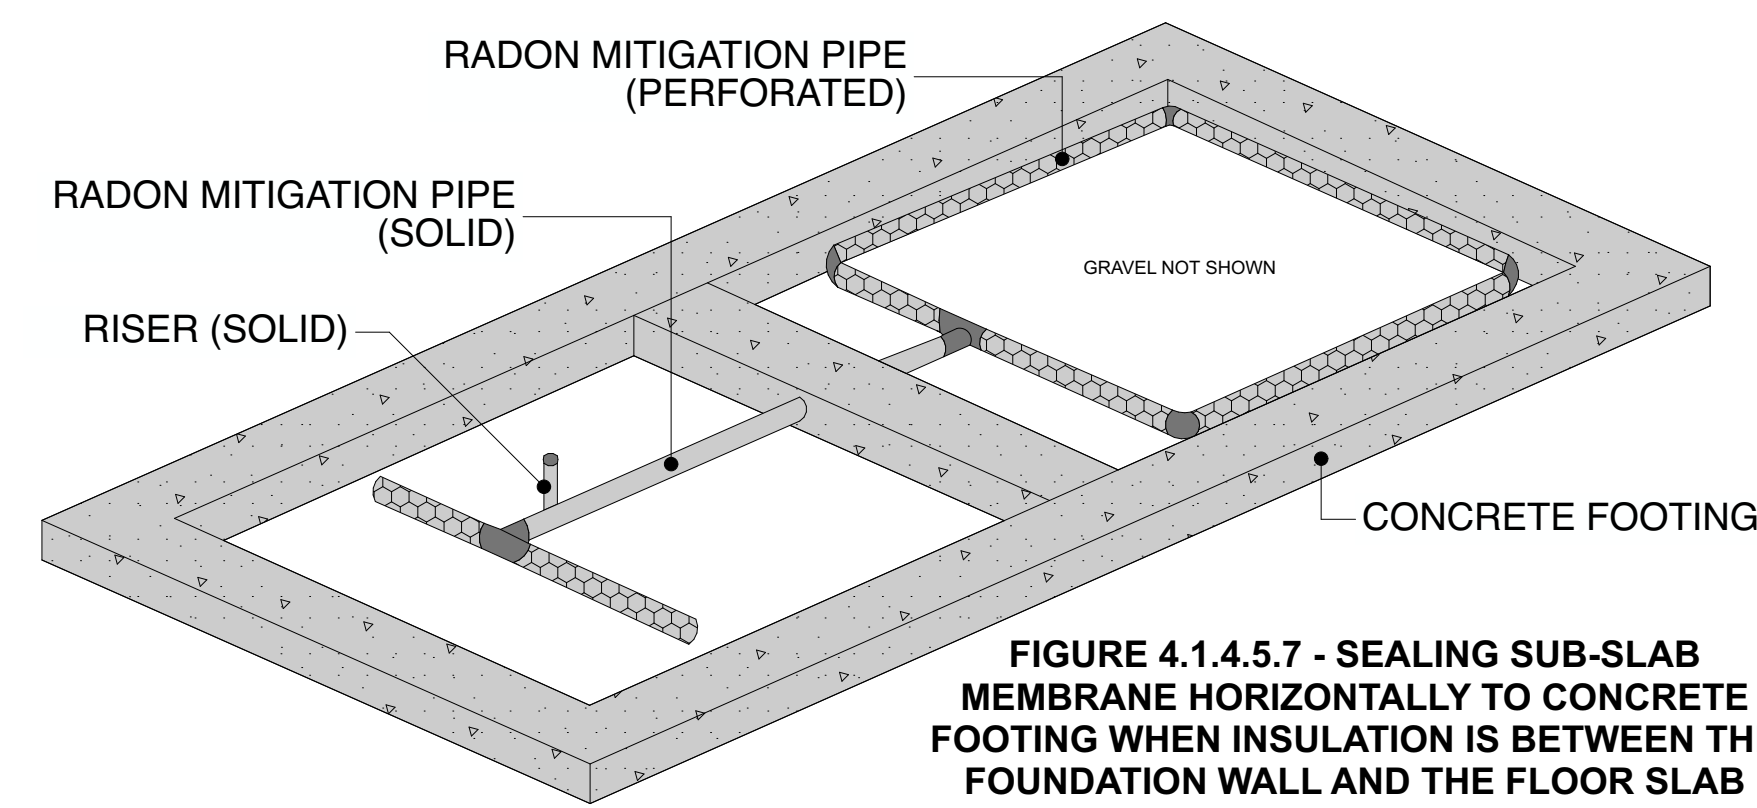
SEALING SUB-SLAB MEMBRANE HORIZONTALLY TO CONCRETE FOOTING WHEN INSULATION IS BETWEEN THE FOUNDATION WALL AND THE FLOOR SLAB
